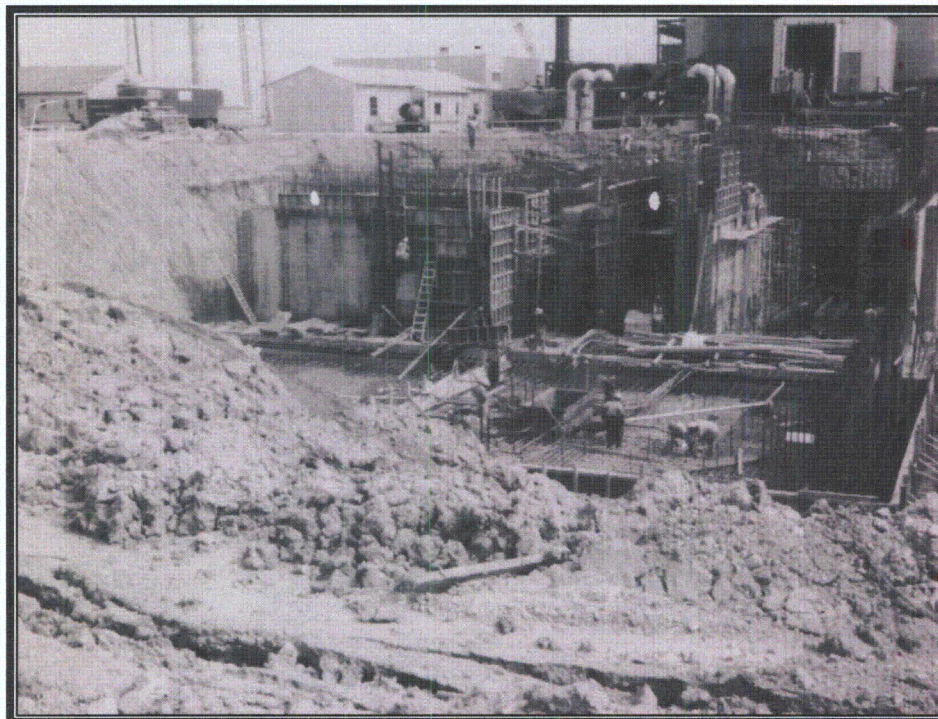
Construction photograph of underground portions of FARB (Courtesy DECo)
